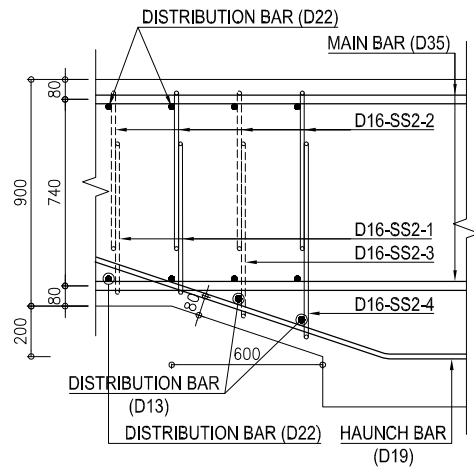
DETAIL OF STIRRUP AT THE HAUNCH OF GIRDER
